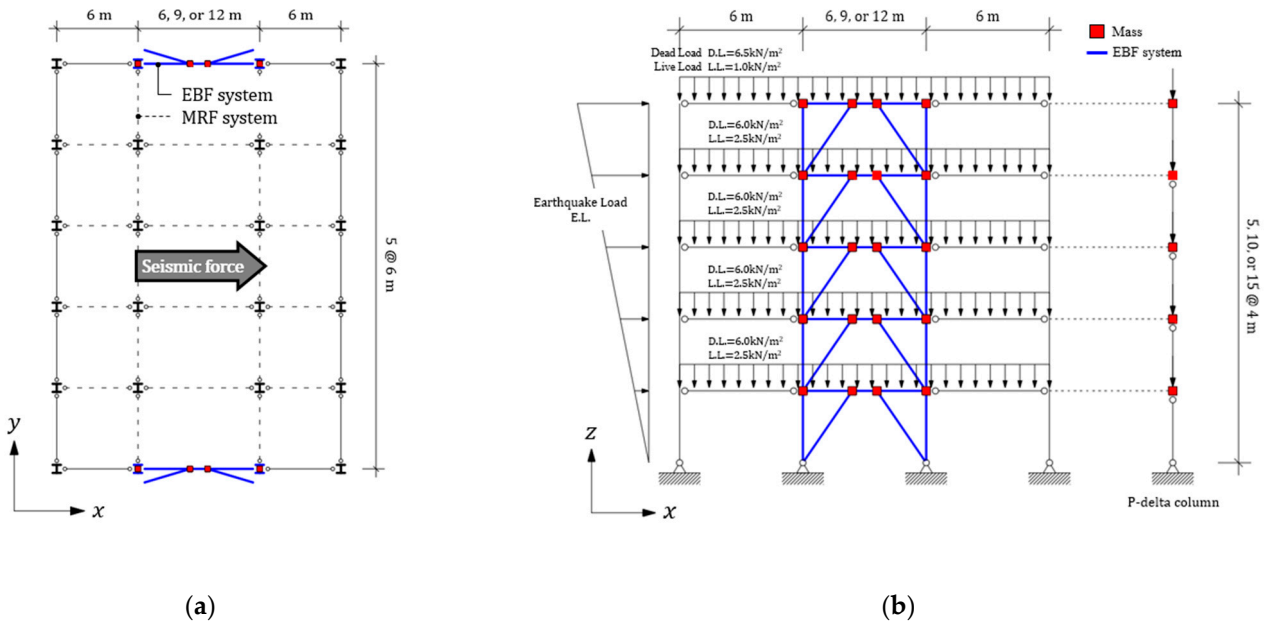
Configuration of the example building: (a) plan view; (b) elevation view (x-axis direction).
